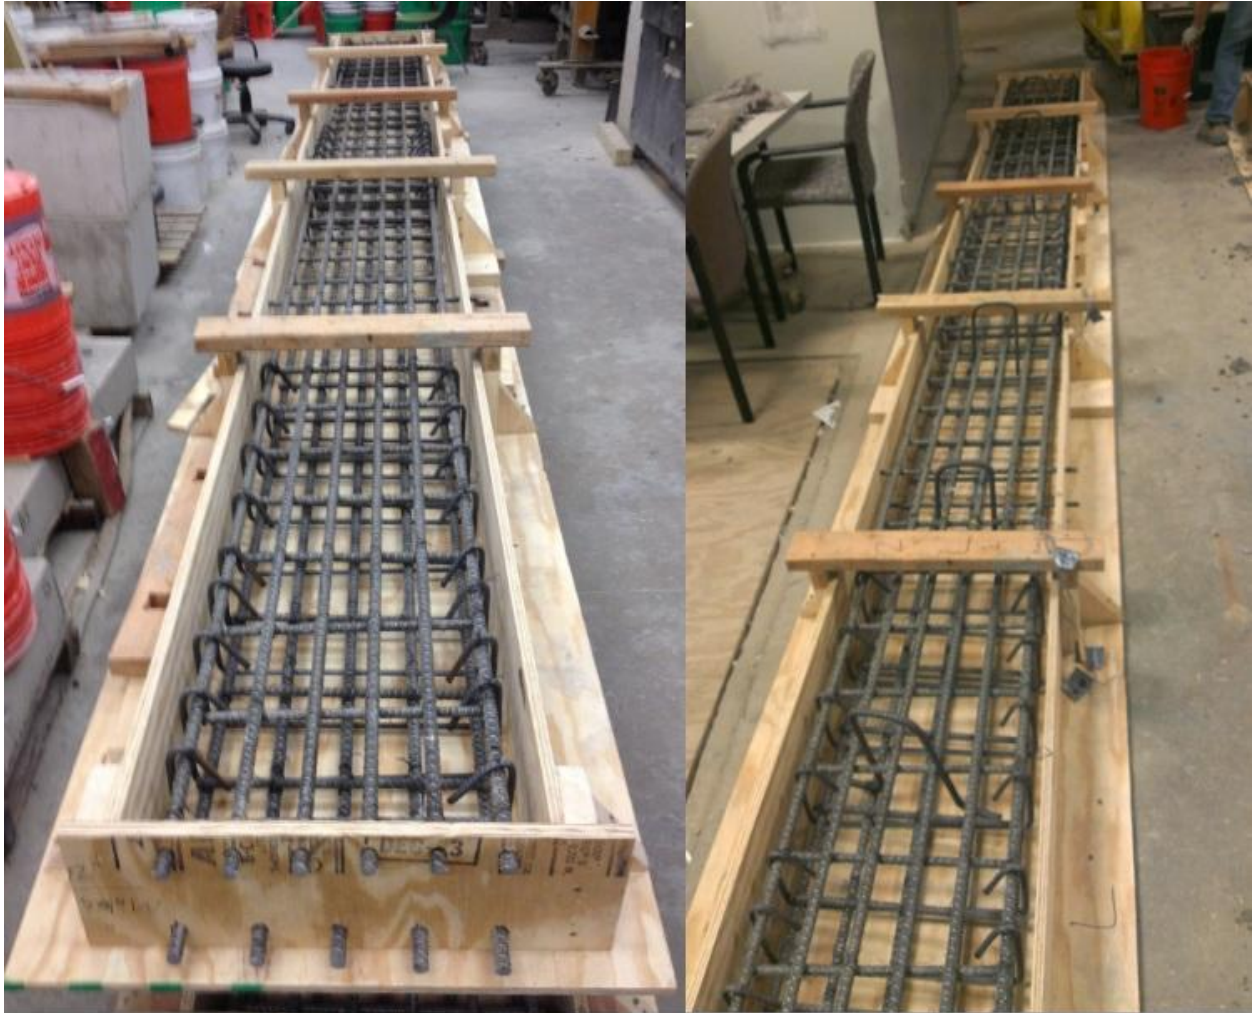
Formwork for 2-Span Continuous Slabs CS1 and CS2
